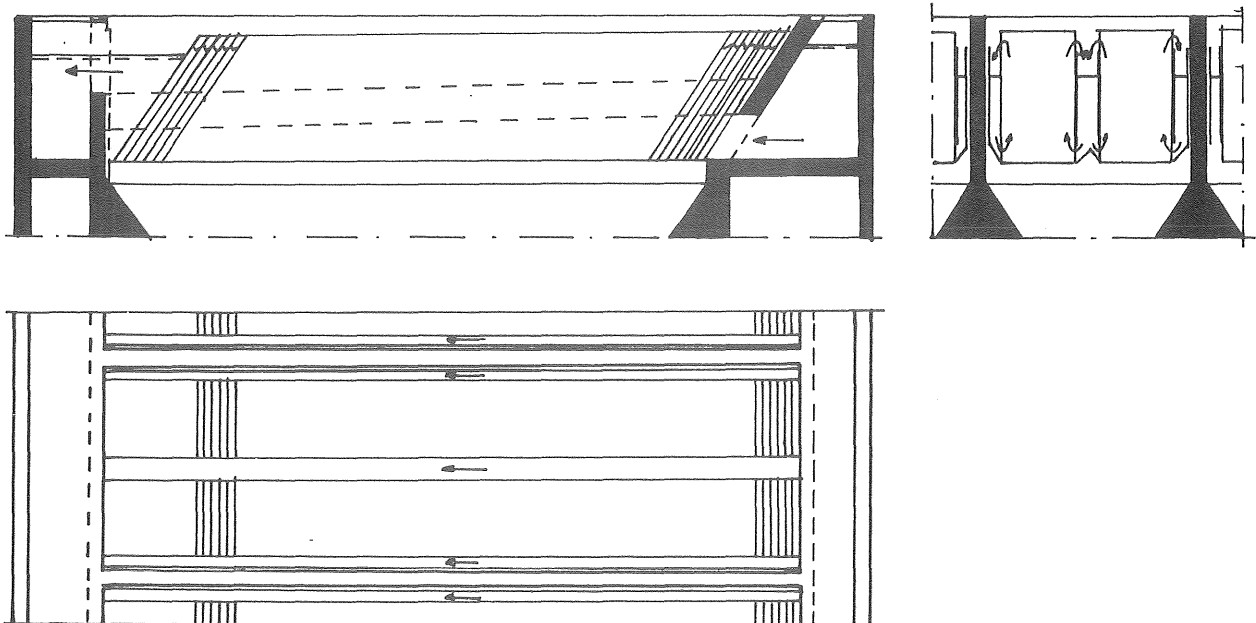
Section and plan of a lamella sedimentation unit.
